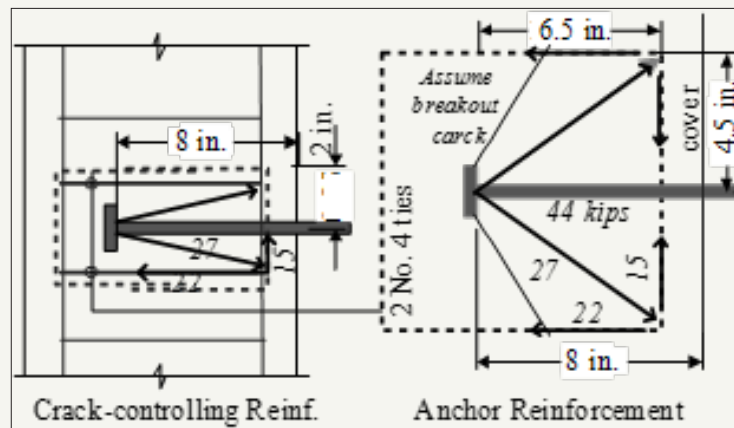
Strut-and-Tie models for the specimen design (1 in.=25.4mm).
